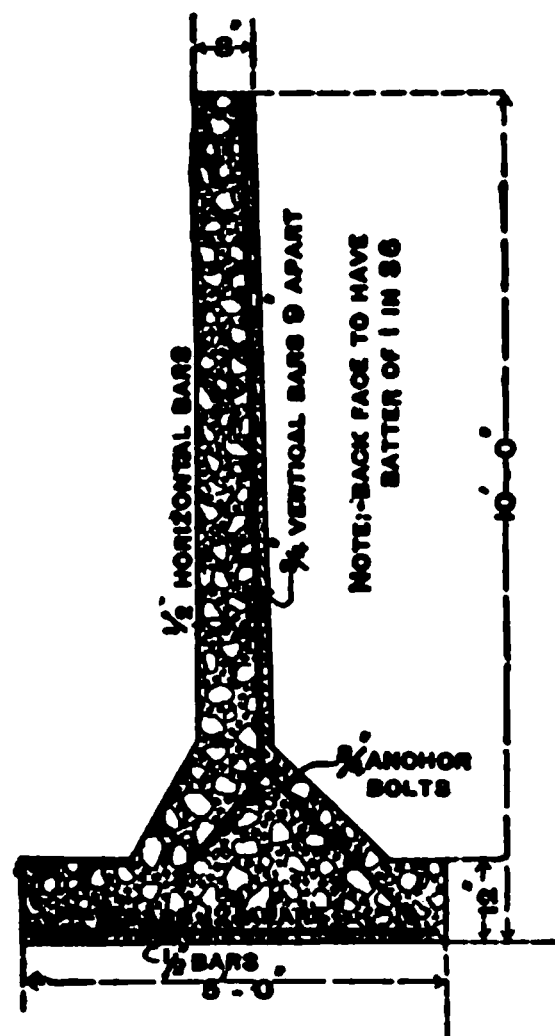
Ten-foot Reinforced Retaining Wall.
